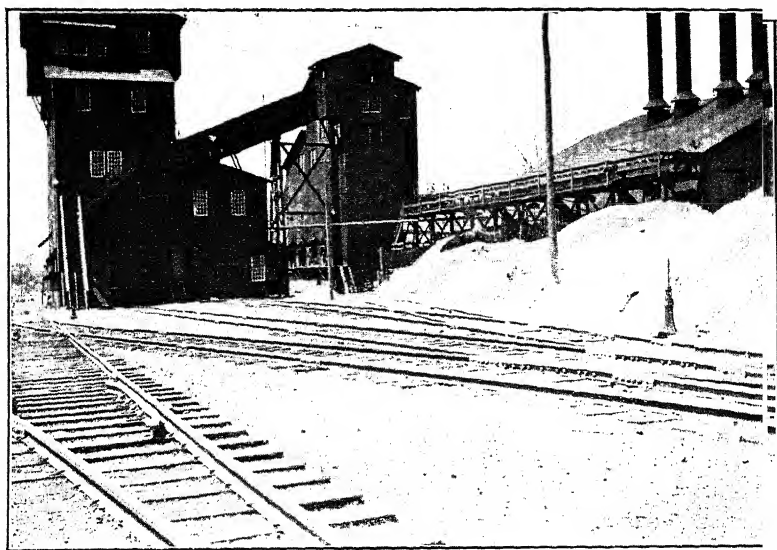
RANSOM PLANT. RELOADING-TOWER, SCREENINGS-SEPARATOR, AND POWER-PLANT.
